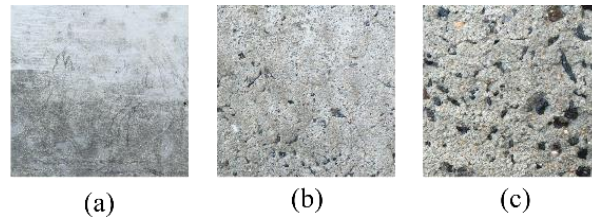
Pictures of the slab after surface roughening by water jetting: (a) Reference – R; (b) Low level roughening – L; (c) High level roughening – H.
